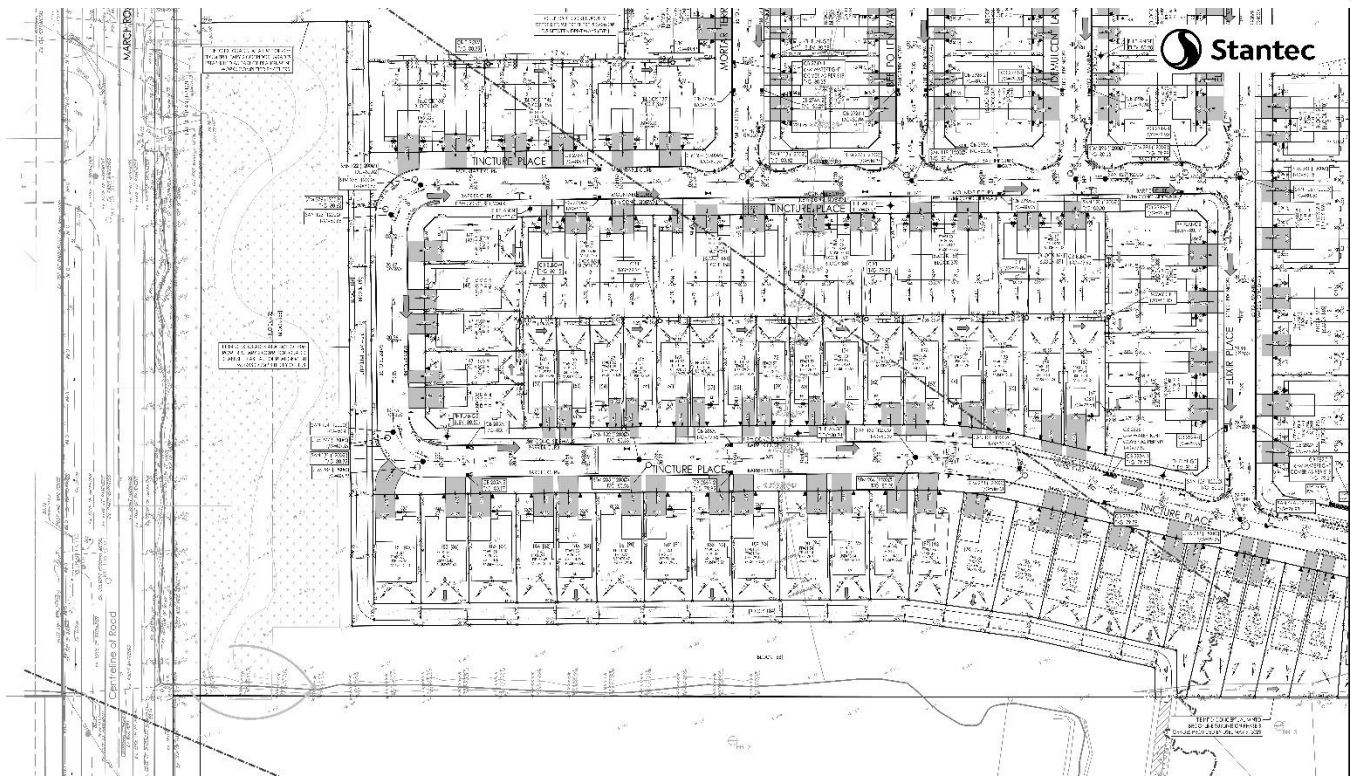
Drawing GP-4 of the finished (as-built) Grading Plan of the subject lands, prepared by Stantec Consulting Inc. (May, 2025).
